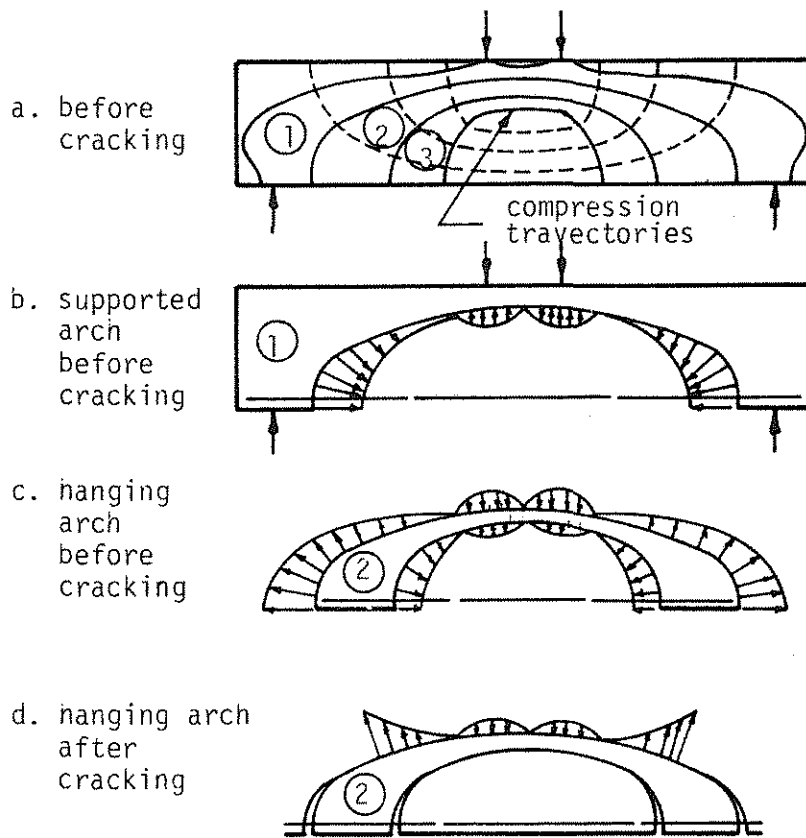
Internal Arches in a Reinforced Concrete Beam (22).
